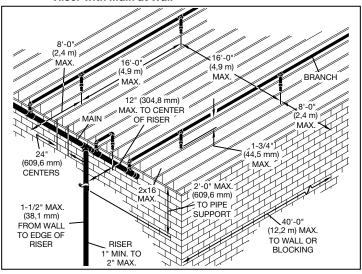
Unfinished Basement, Solid Wood Joists, Riser in Corner
